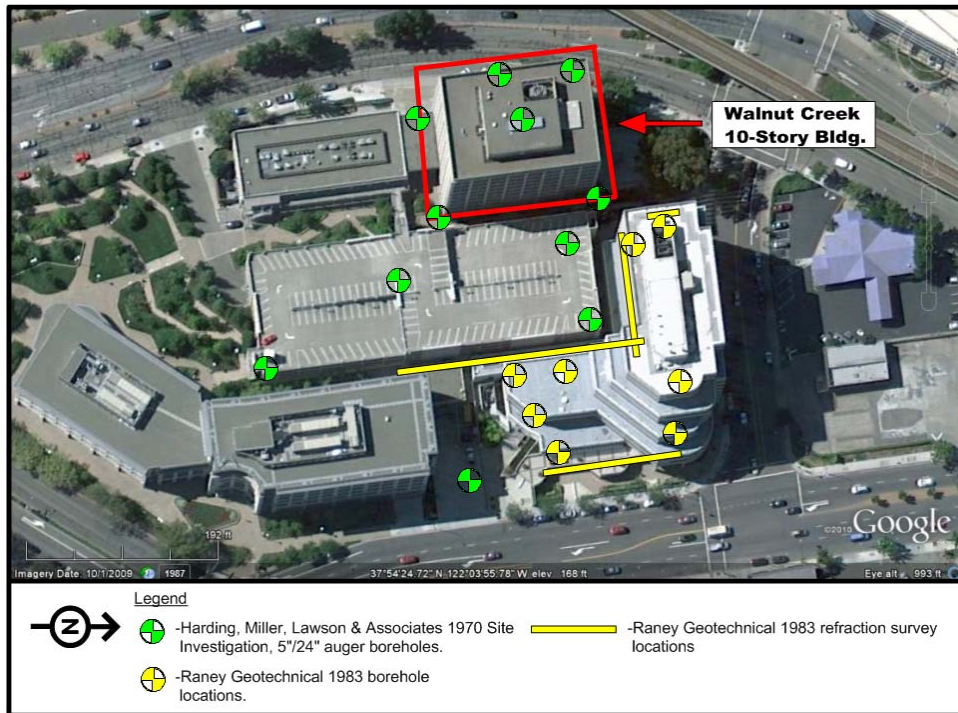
Site plan of Walnut Creek office building showing locations of borings and refraction lines
